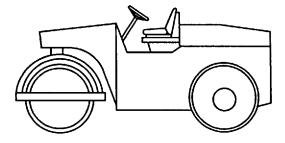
Static dual- or three-drum roller with rigid frame and yoke-mounted steering drum
